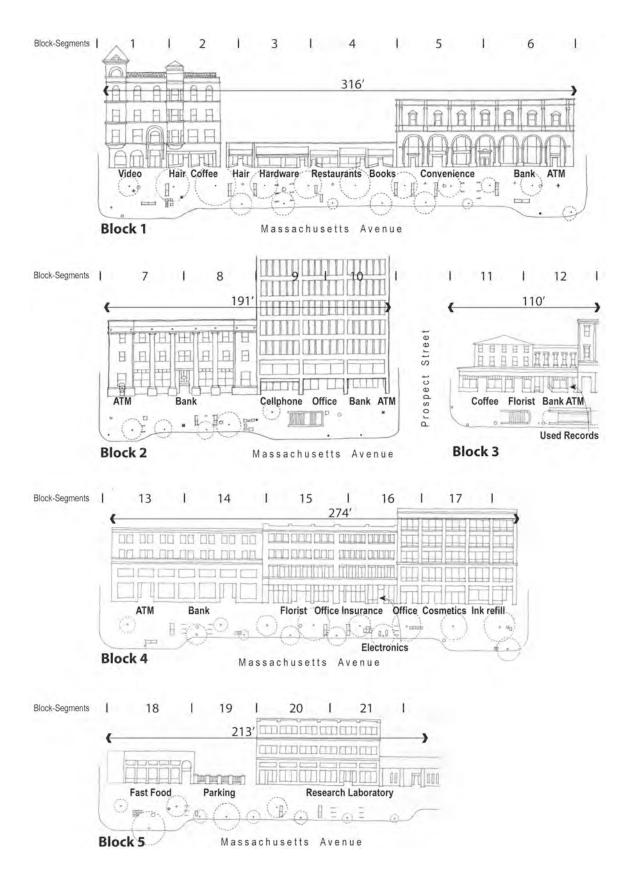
A combined plan and elevation of five blocks studied on Massachusetts Avenue
